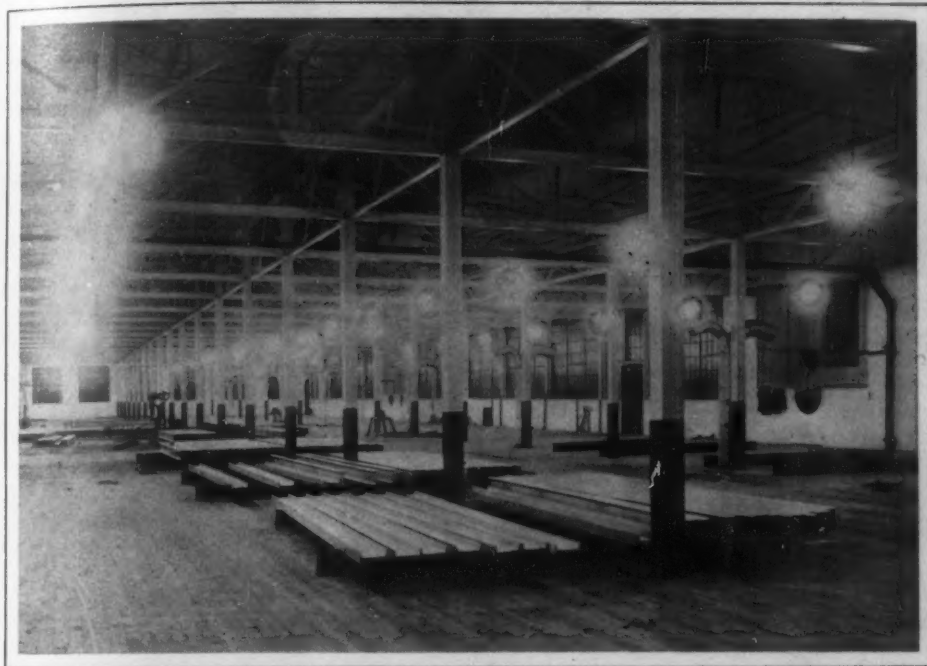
Interior View of One of the Buildings, Showing the Heating, Lighting and Fire Protection Arrangements
